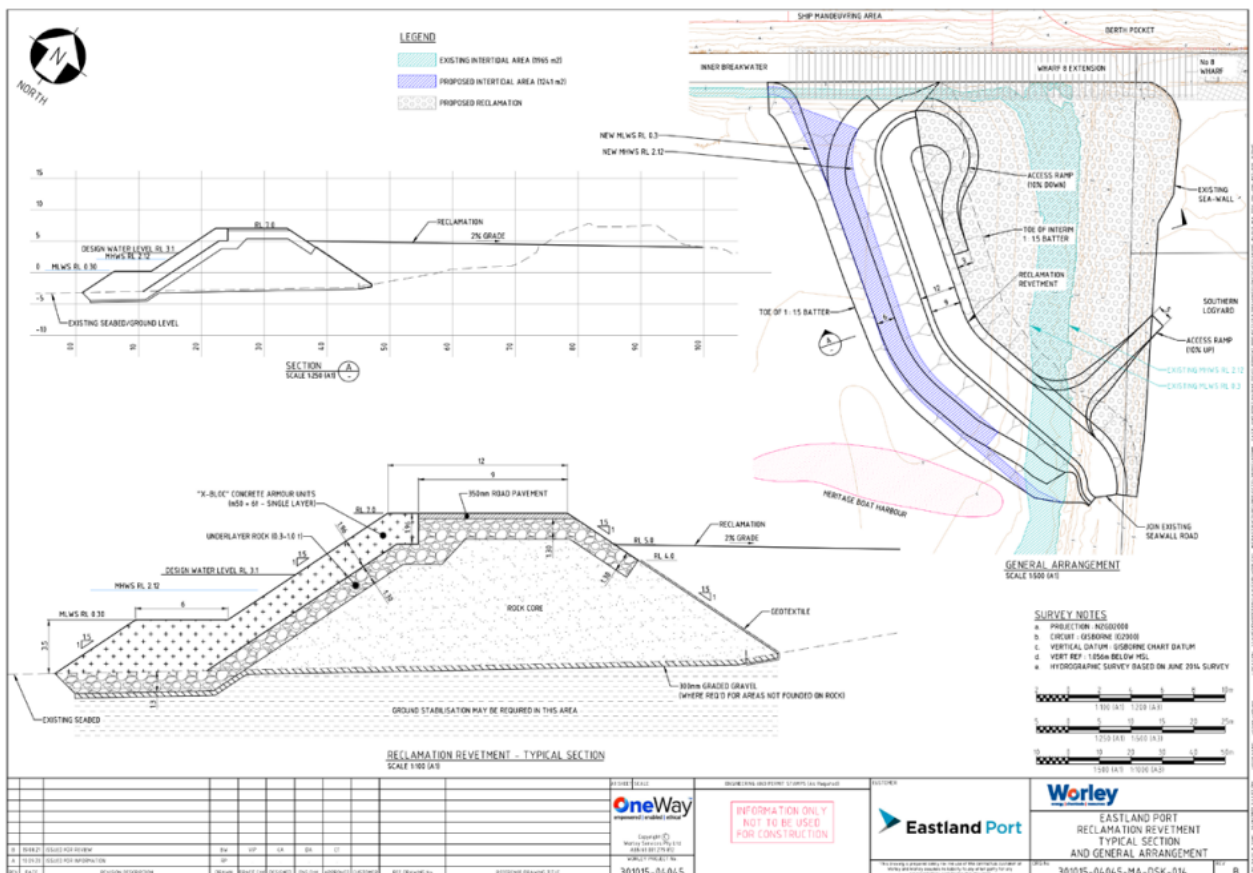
Proposed Reclamation Site & Typical Cross Section Plan
